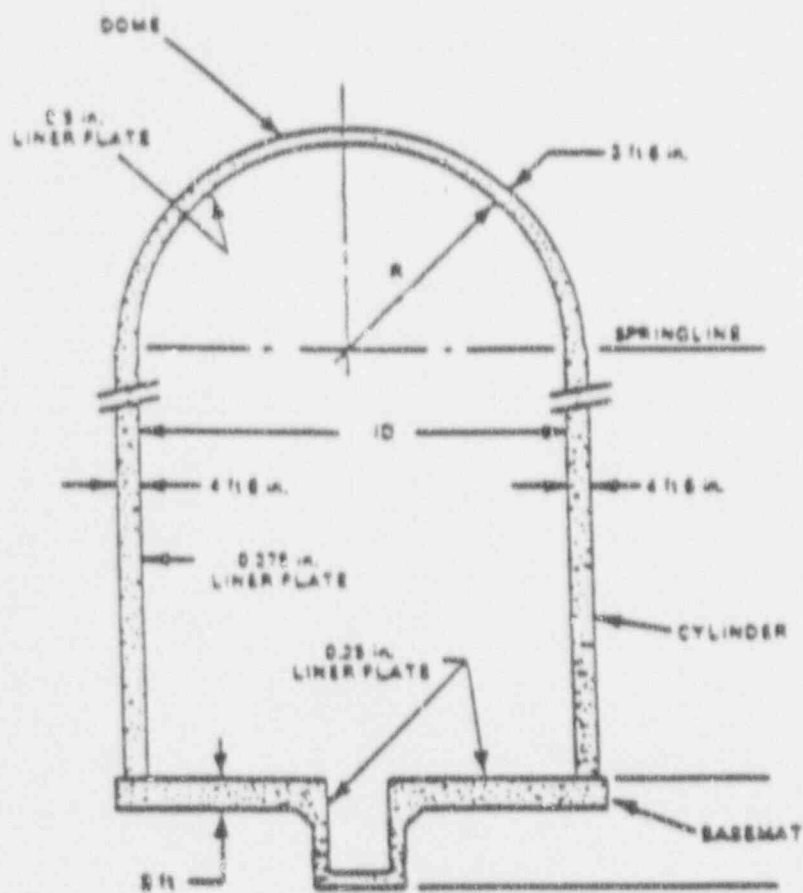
Typical Steel-Lined Reinforced Concrete Containment
